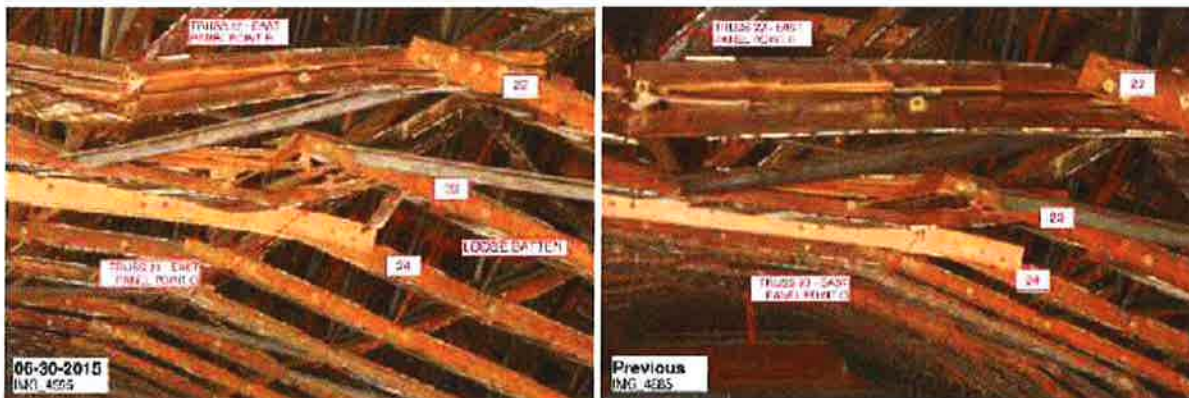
Truss damage progression at Trusses 22 and 23 East near Panel Points R and O.
